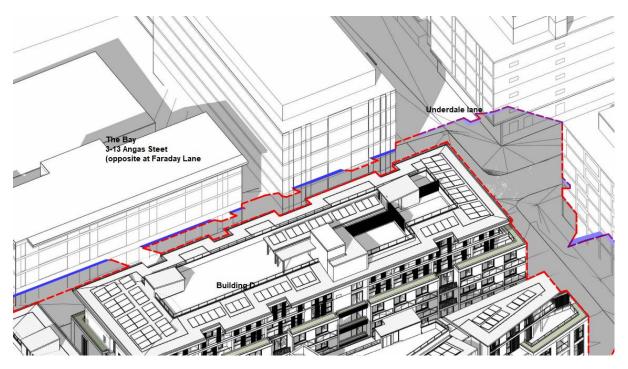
June 21 – 1pm. Shadow cast onto building opposite at Faraday Lane, onto the development known as The Bay (3-13 Angas Street) and to the buildings at Underdale Lane. The purple outline is the additional shadow cast from the proposed increase in height.
